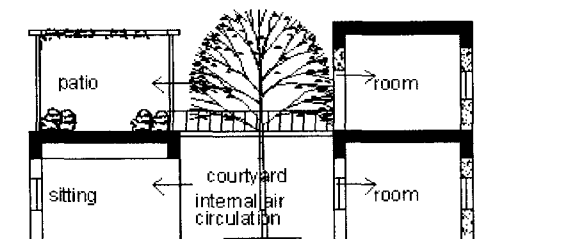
Section through the building shows the air circulation and the interesting spaces within the structure.
